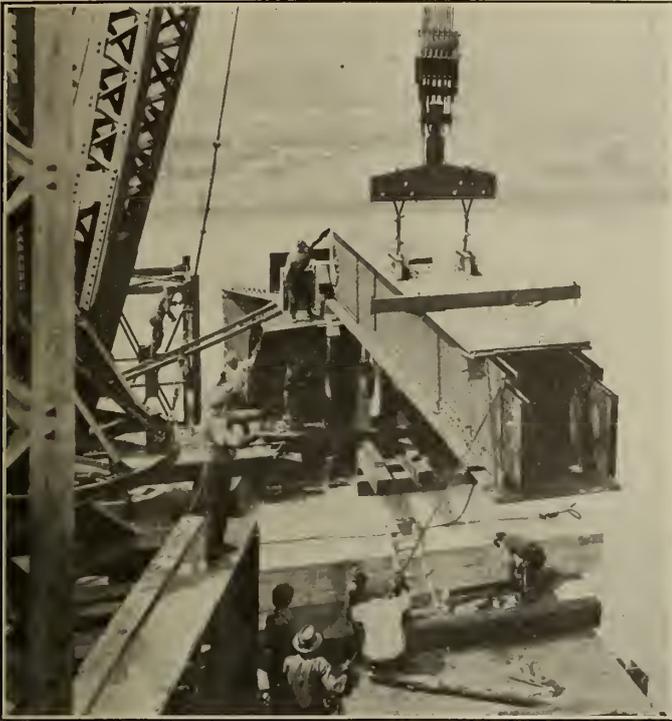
Main Span, South Side—Placing First Bottom Chord Section of Anchor Arm.
